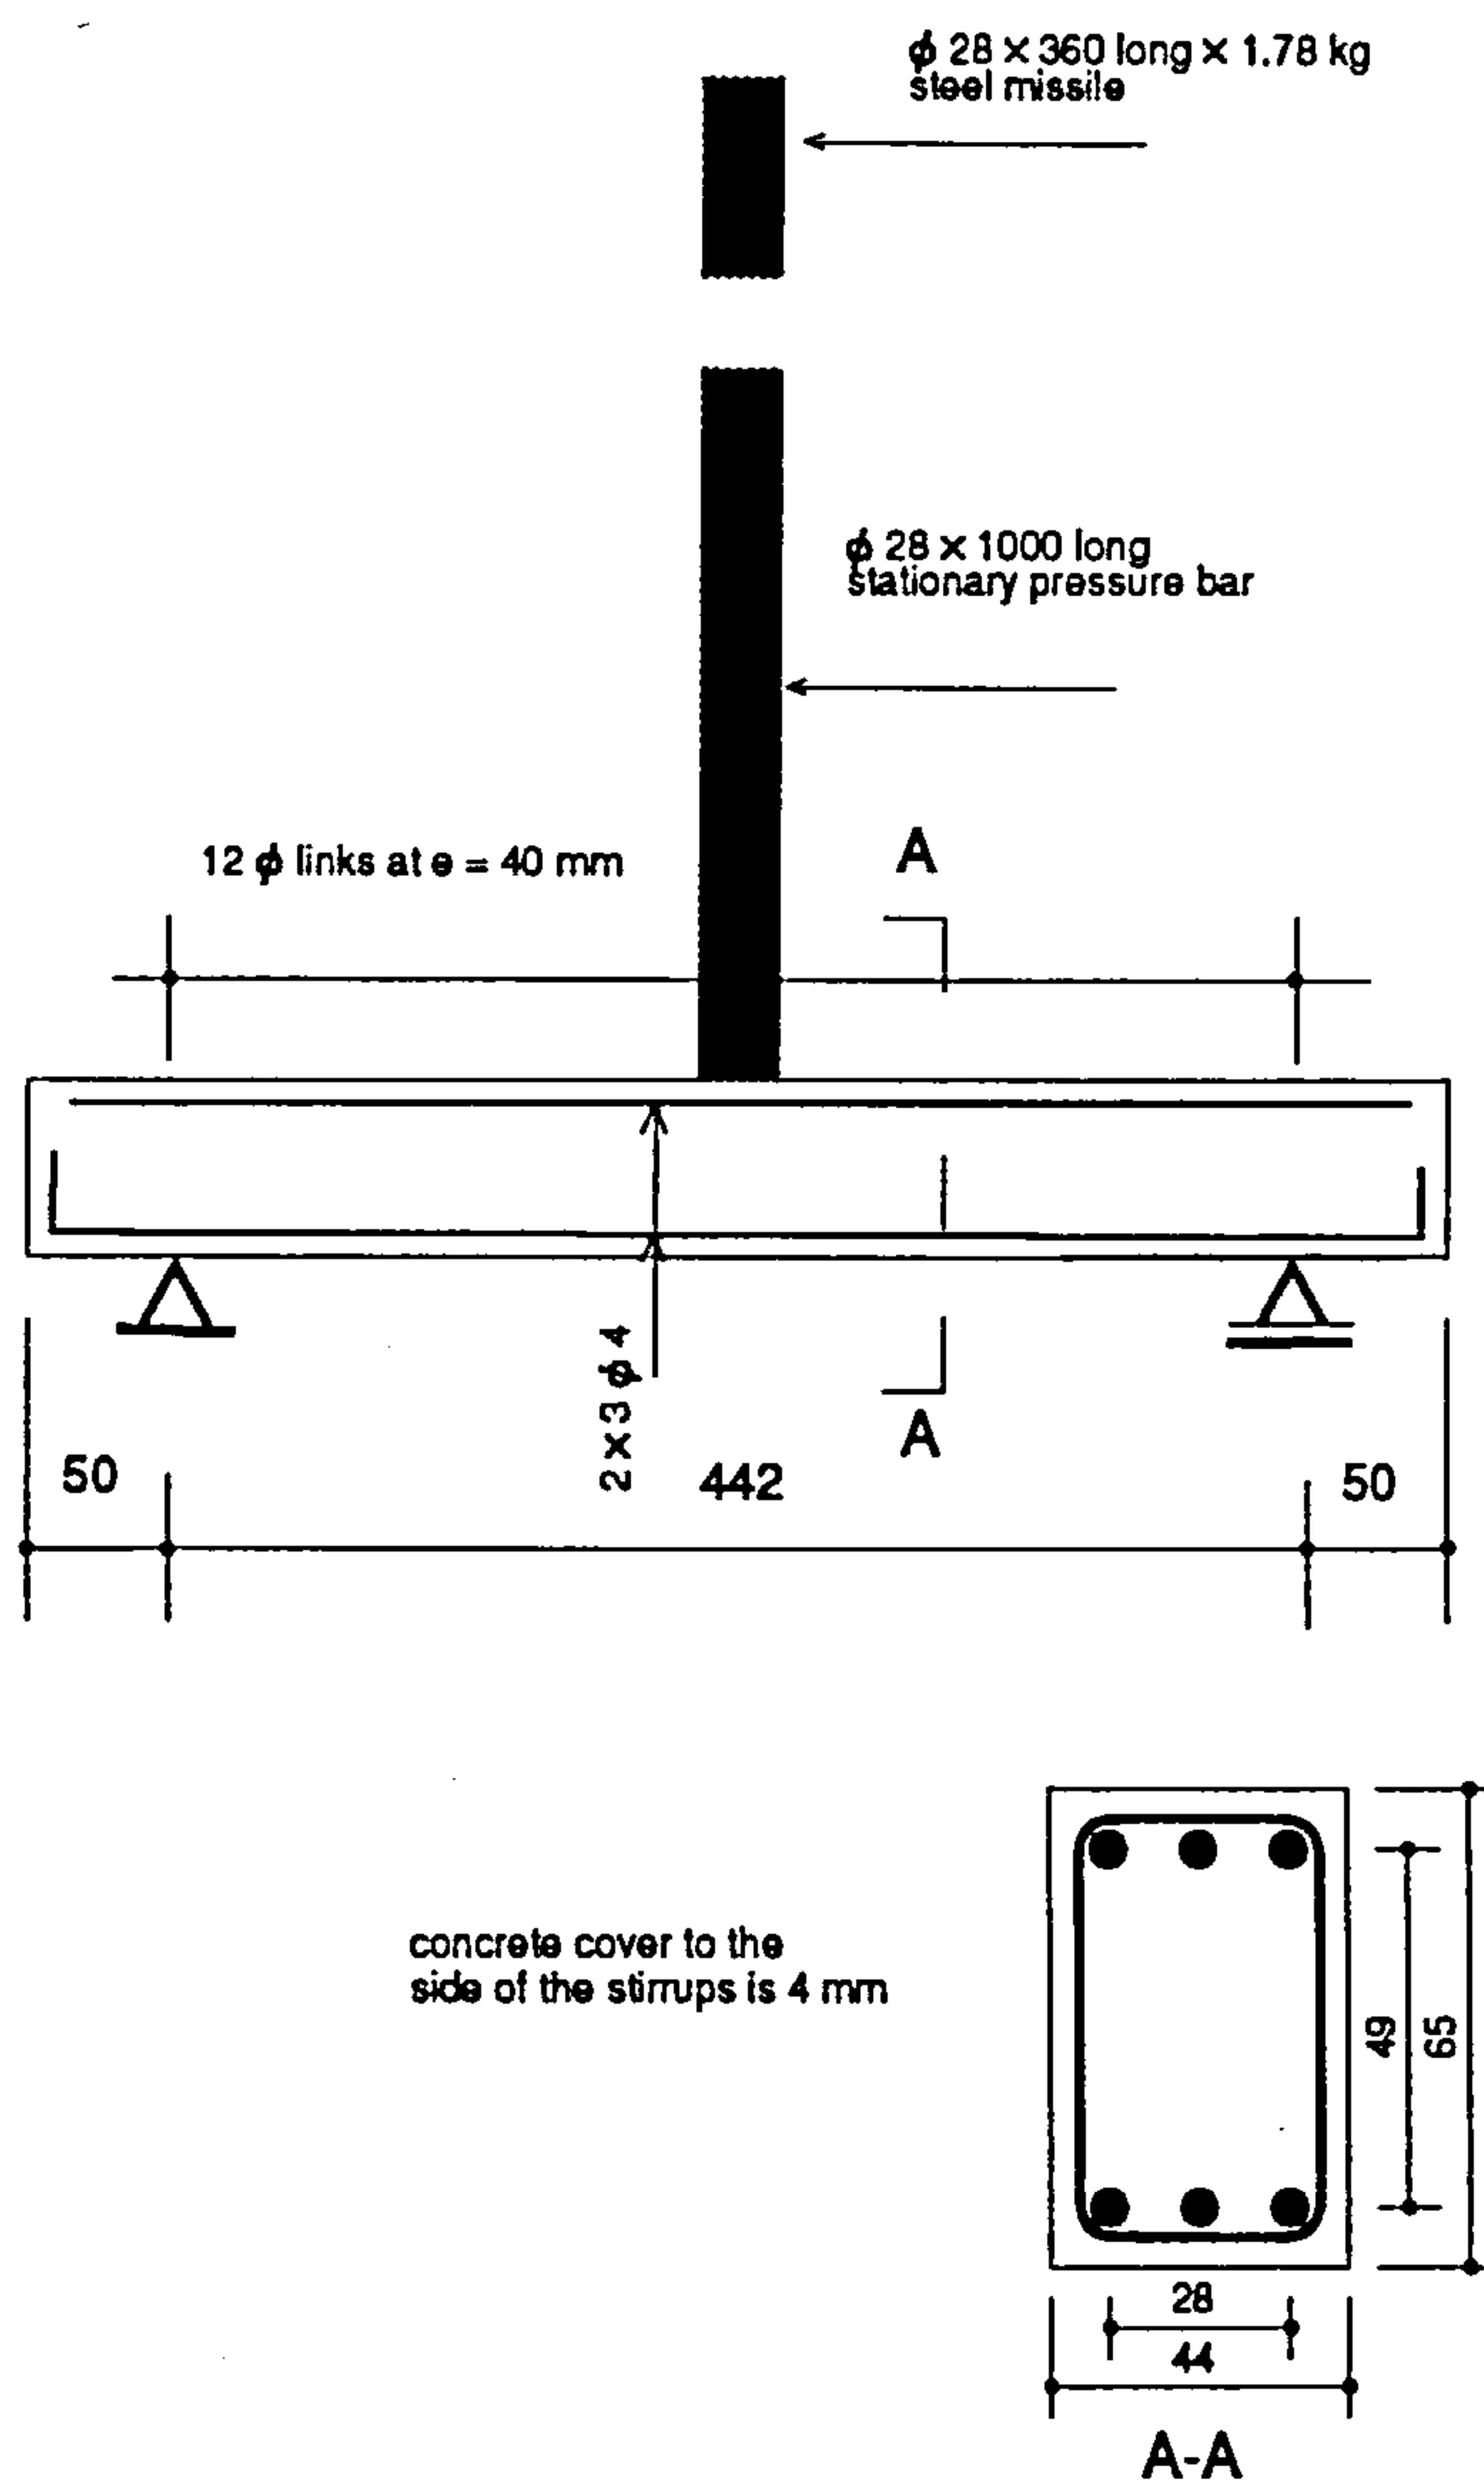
Dimensions, reinforcement and loading arrangement for the beam tested by Watson and Ang [150]
